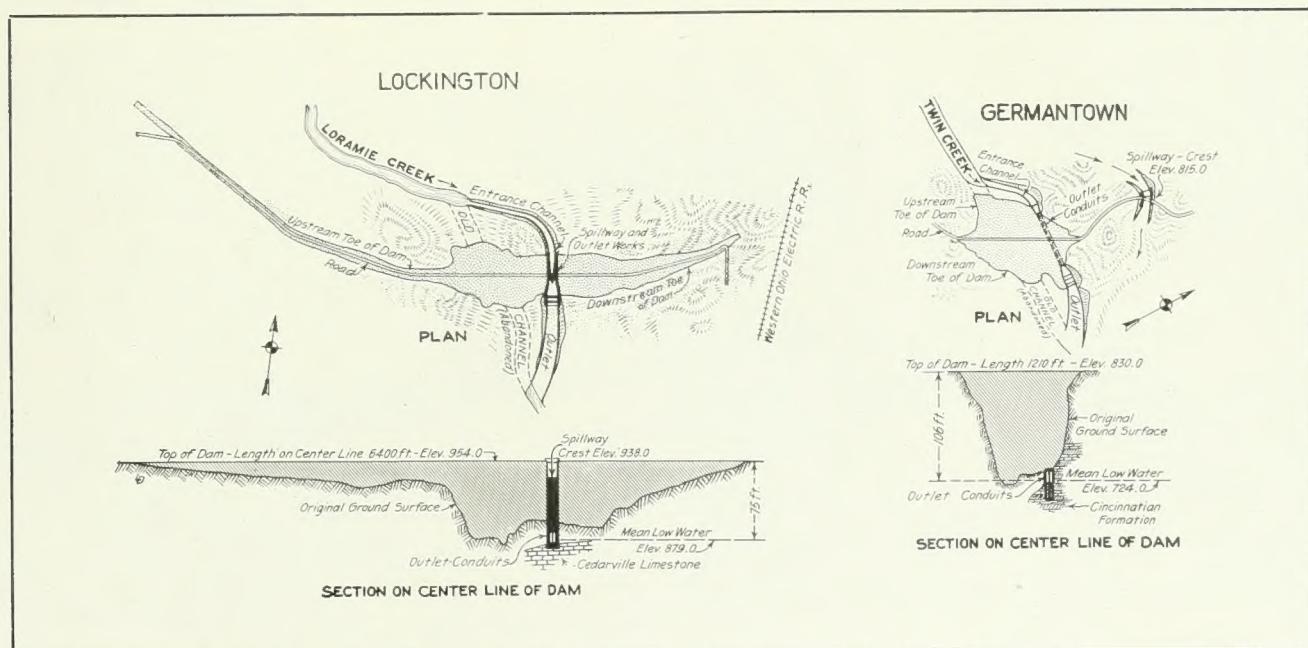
PLANS ILLUSTRATING THE TWO TYPES OF OUTLET STRUCTURE
